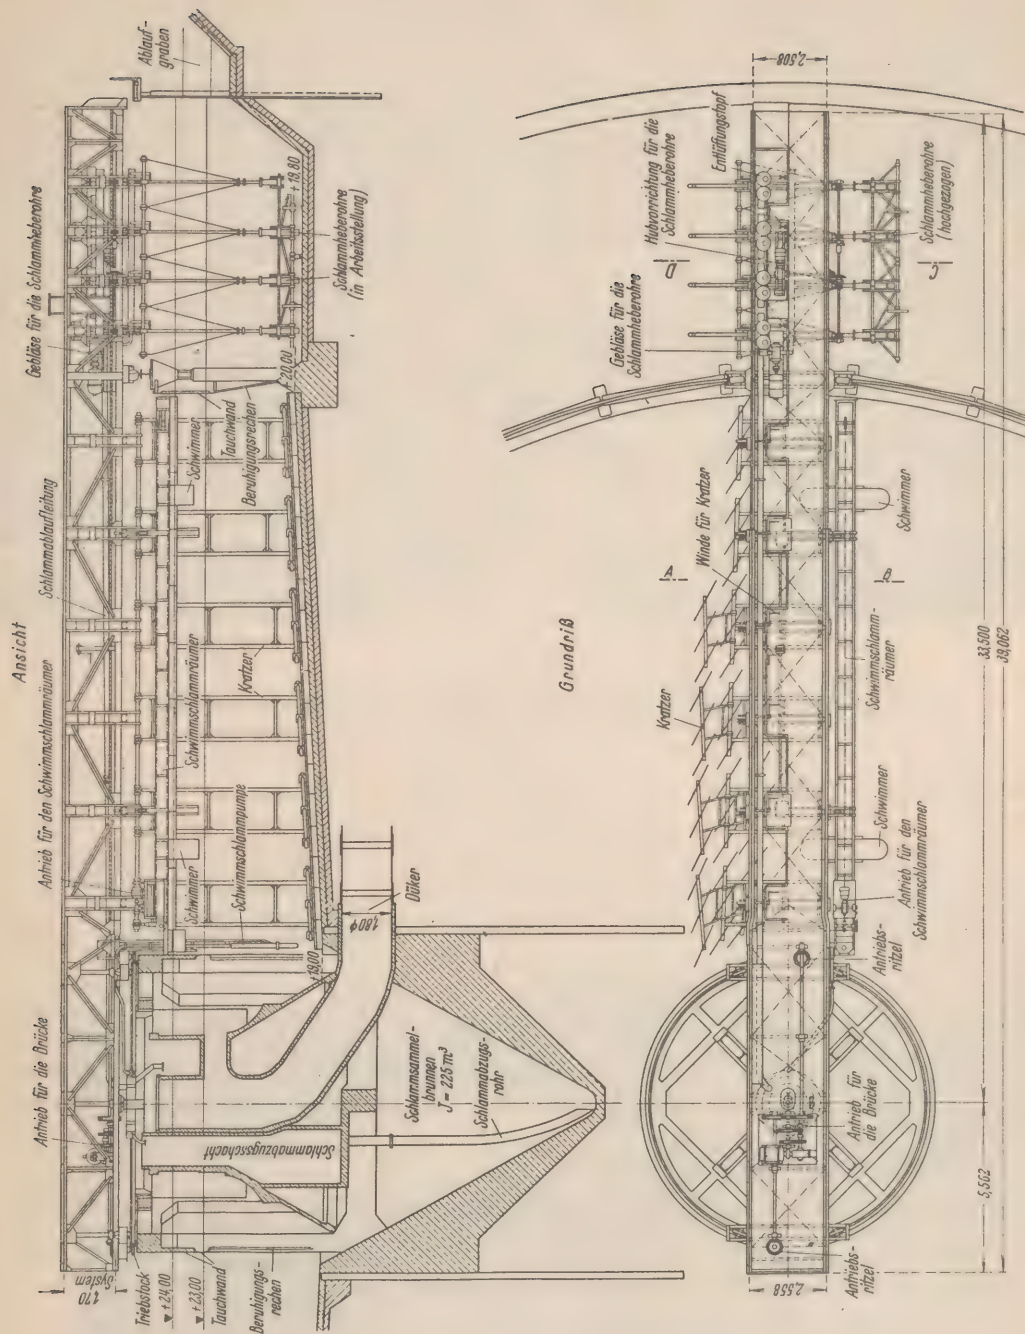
e, Alte-Emscher Sewage Plant. Details Sludge Removal Mechanism and Sludge Hopper
